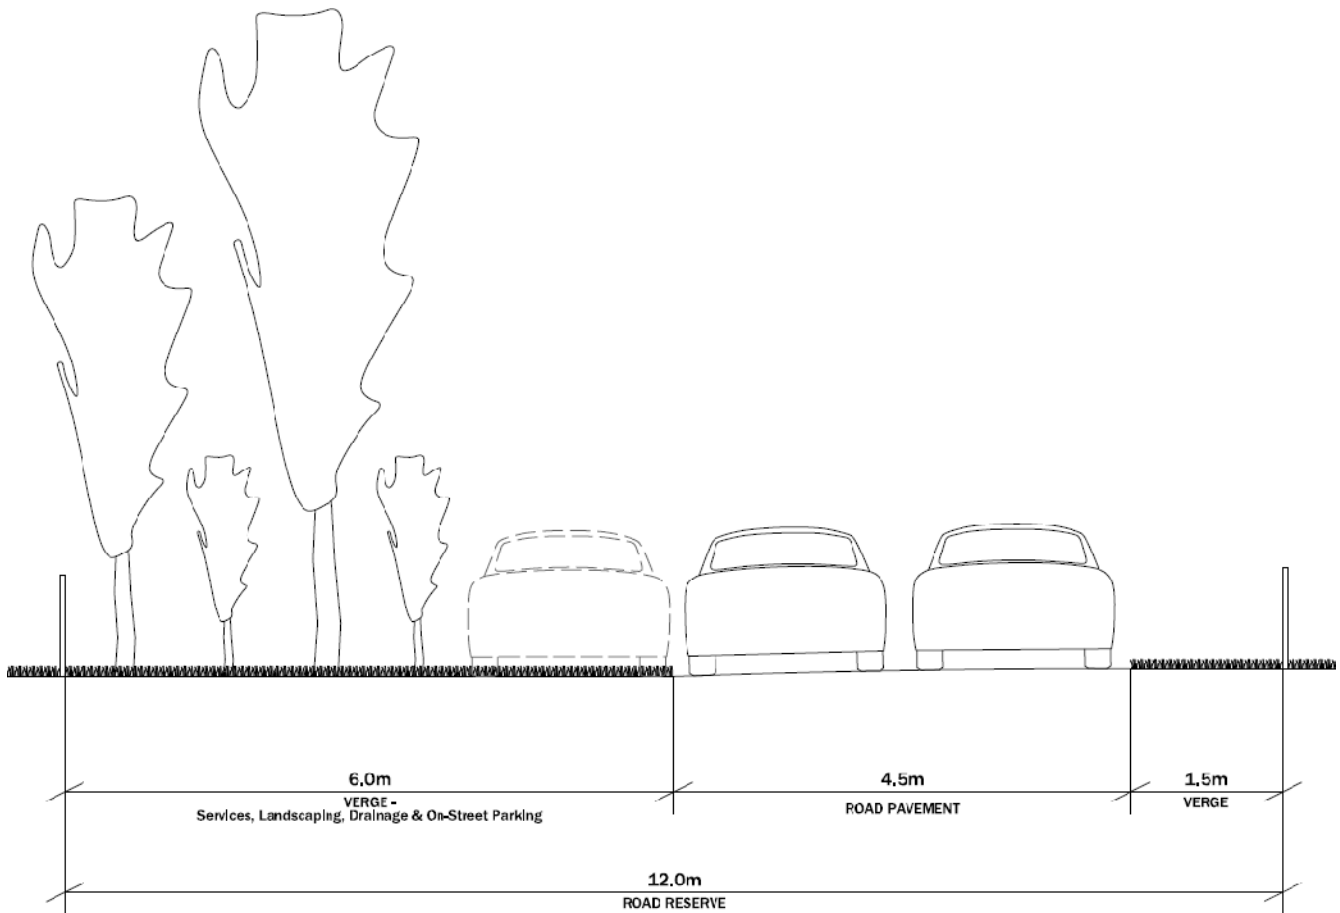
Indicative cross section of the one way road backing onto the existing residential area.
